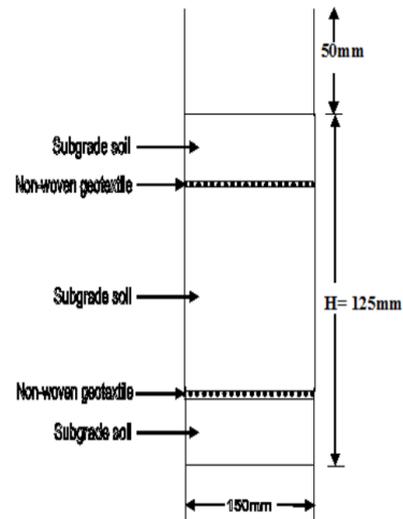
Cross-sectional diagram showing the subgrade soil and non-woven geotextile layers
